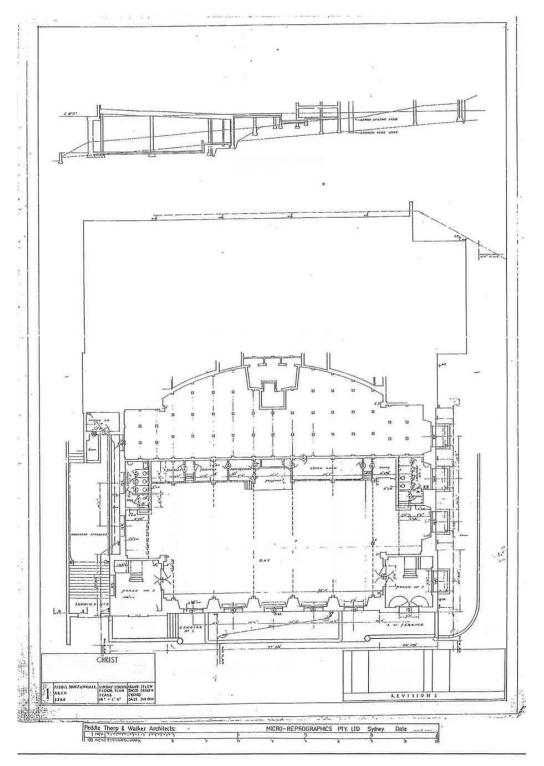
Sunday school floor plan, 1926 (Source: Conservation Plan 2000)
